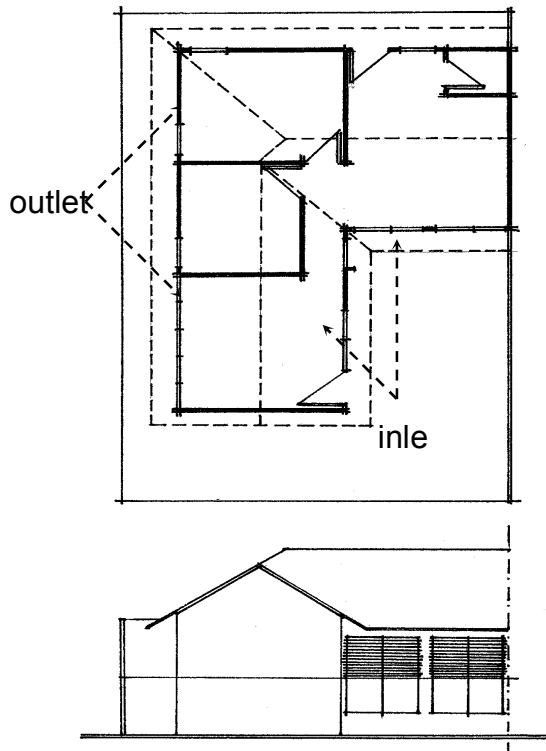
Plan and Front Elevation of The Model (After Mediastika, 2000)
